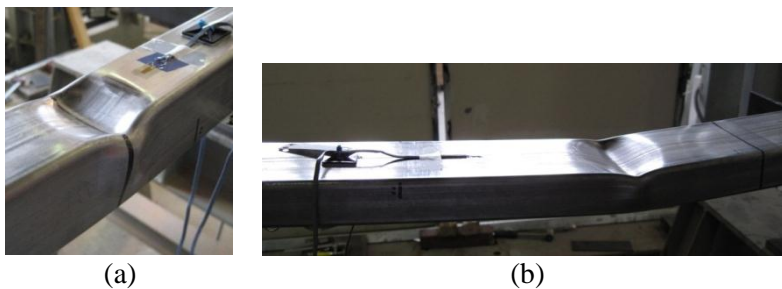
Typical (a) 3-point bending failure mode - Specimen 60x60x2-3P and (b) 4-point bending failure mode - Specimen 100x40x2-4P-Mi
